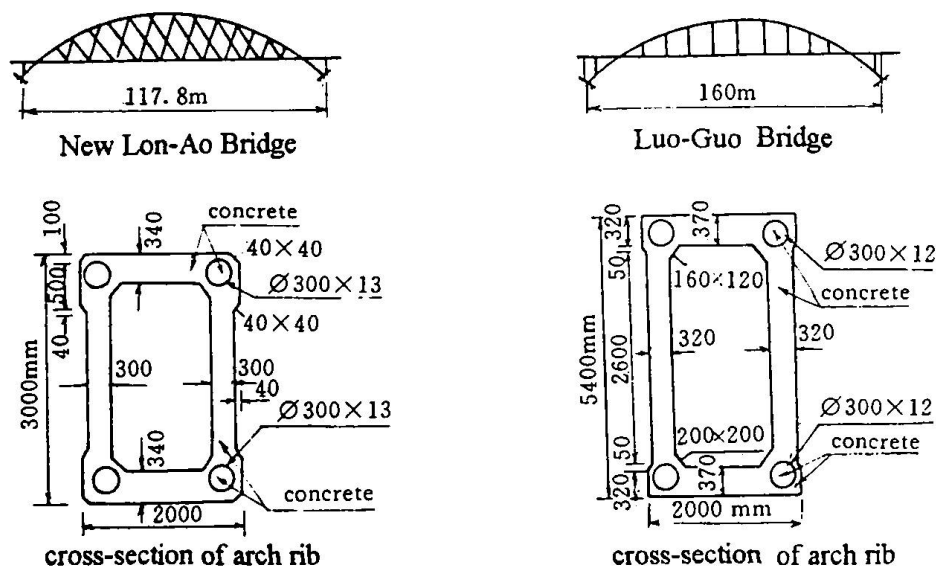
Lon-Ao Bridge and Luo-Guo Bridge
